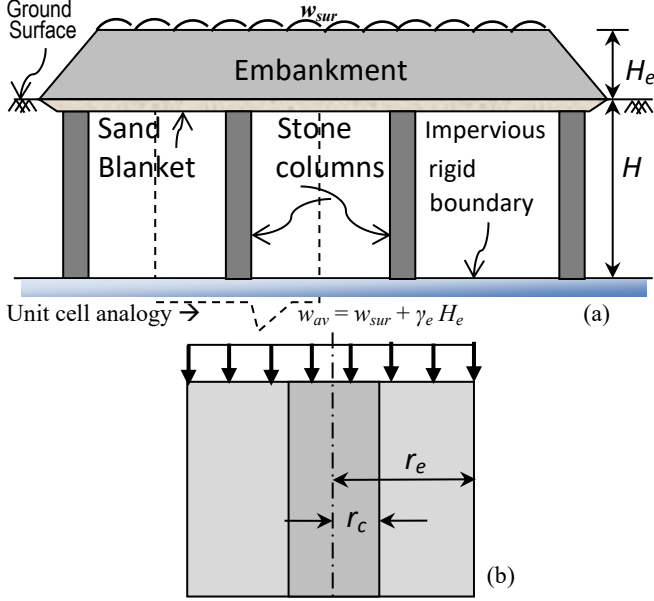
(a) Stone column reinforcement. (b) Unit cell idealization
